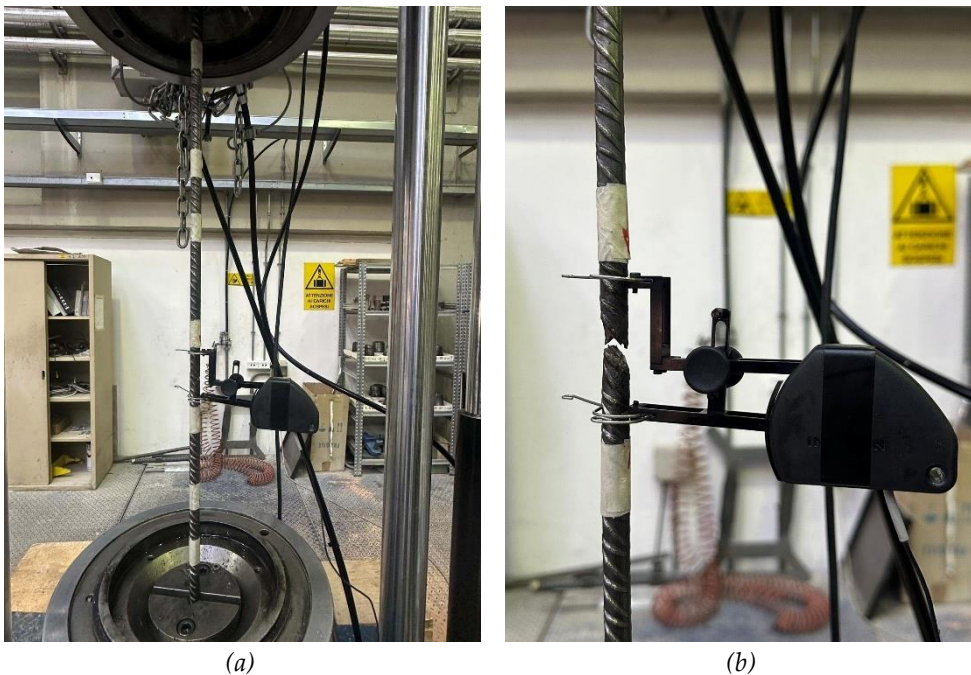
a) tensile test on corroded rebar; b) rebar failure at the pit location.
